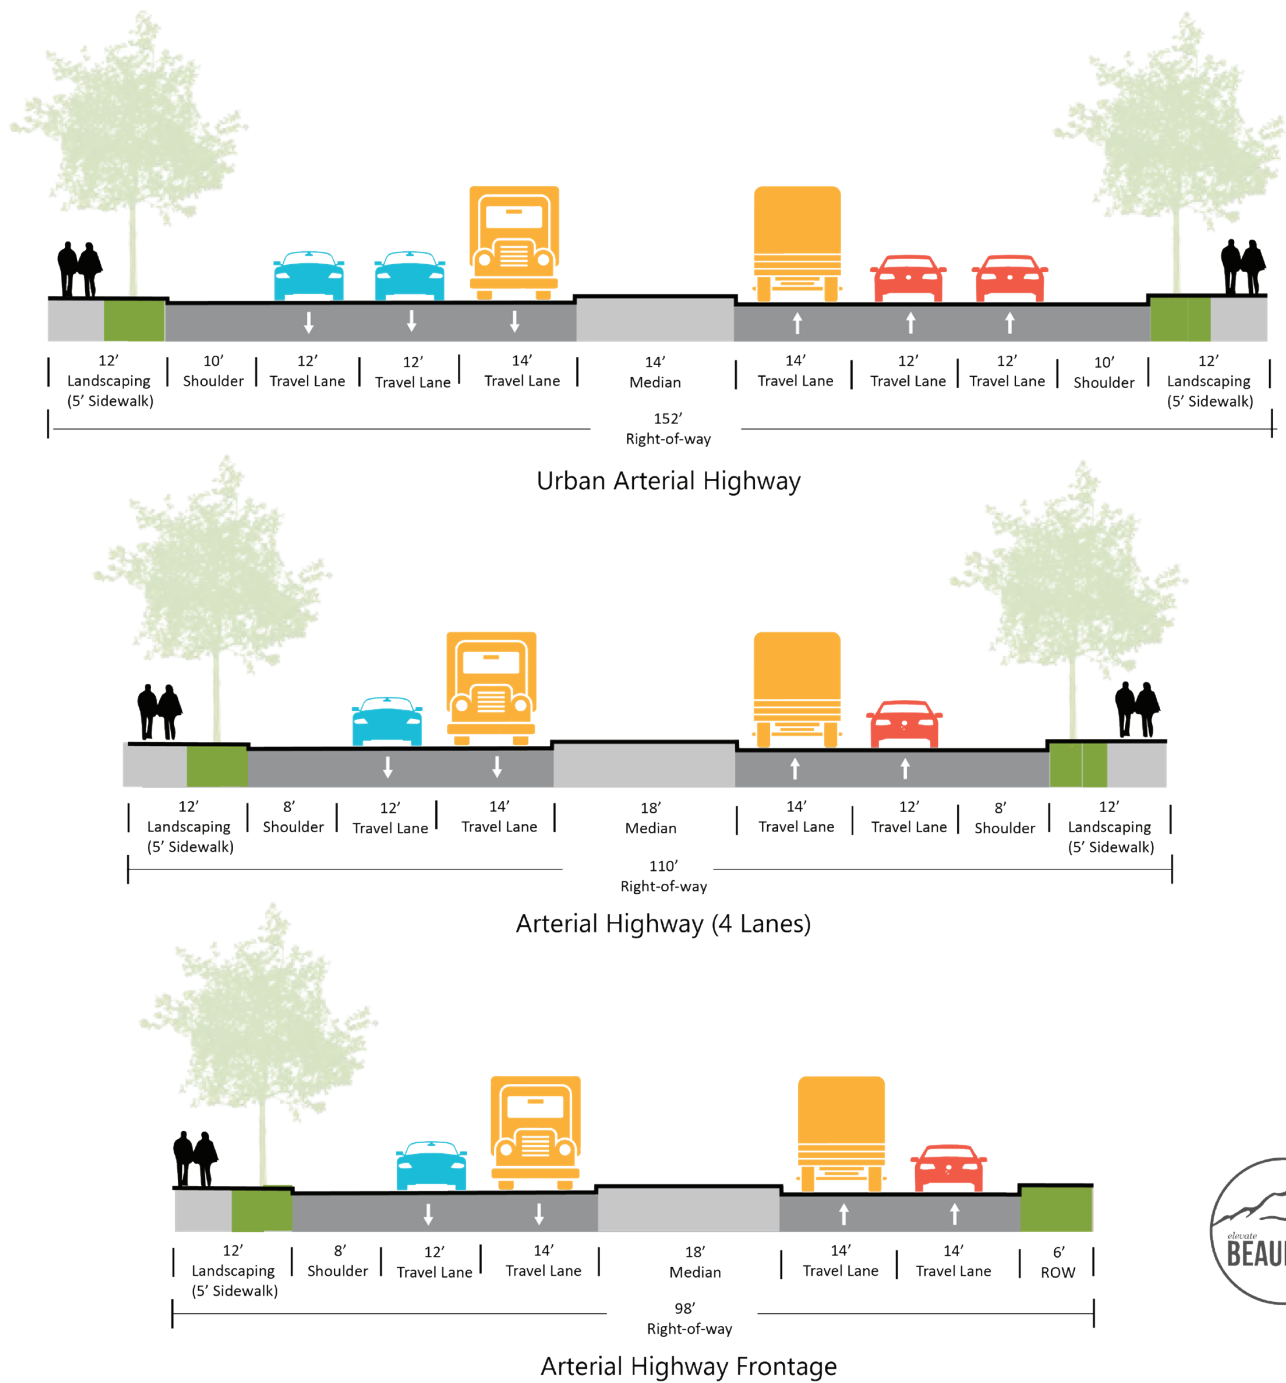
Roadway Cross Sections - Arterial Highway
